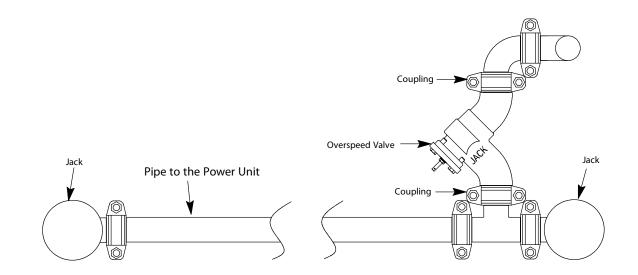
3" Dual Jack Overspeed In-Line Valve Installation
